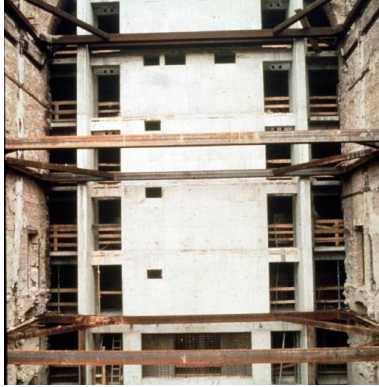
Darmstadt theatre [159] Figure 2-11 Lisbon building (Mazzolani) [159] by (Mazzolani) courtesy of F.M. Mazzolani
